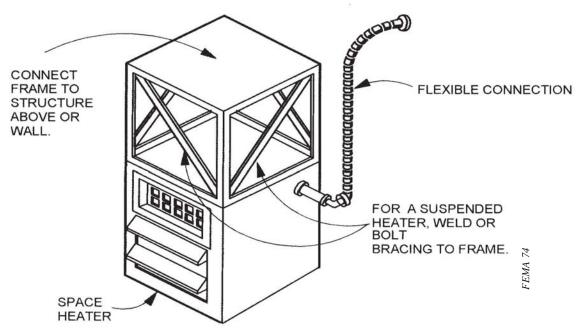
Prevent suspended equipment from falling with proper connections and bracing.
